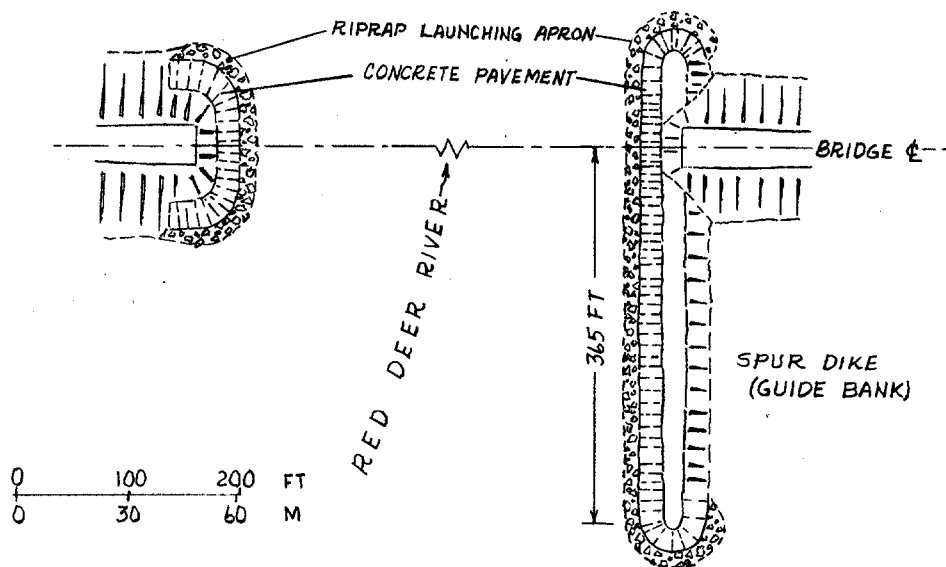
Plan sketch of guide bank (spur dike) and abutment fill-slope protection at PH-587 bridge, Red Deer River.
